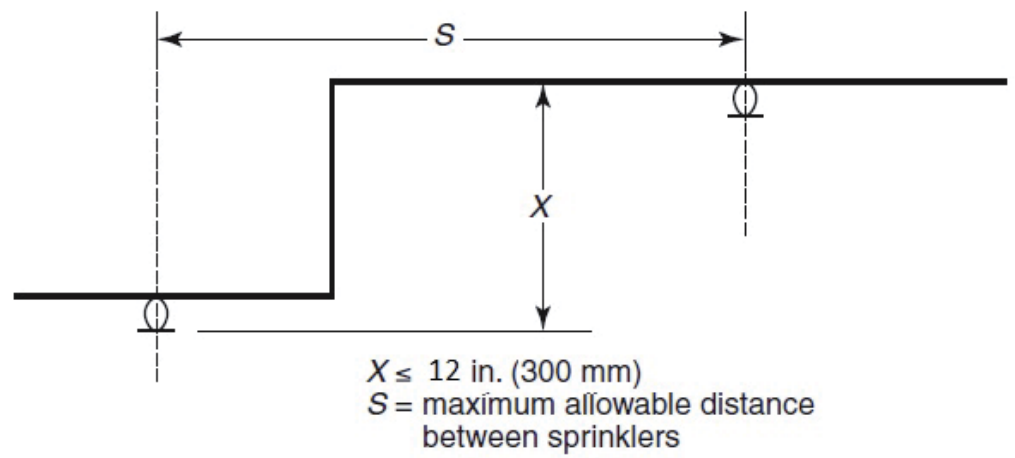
Figure X.X.X.X (B) Vertical Change in Ceiling Elevation Less Than or Equal to 12 in (300 mm).
